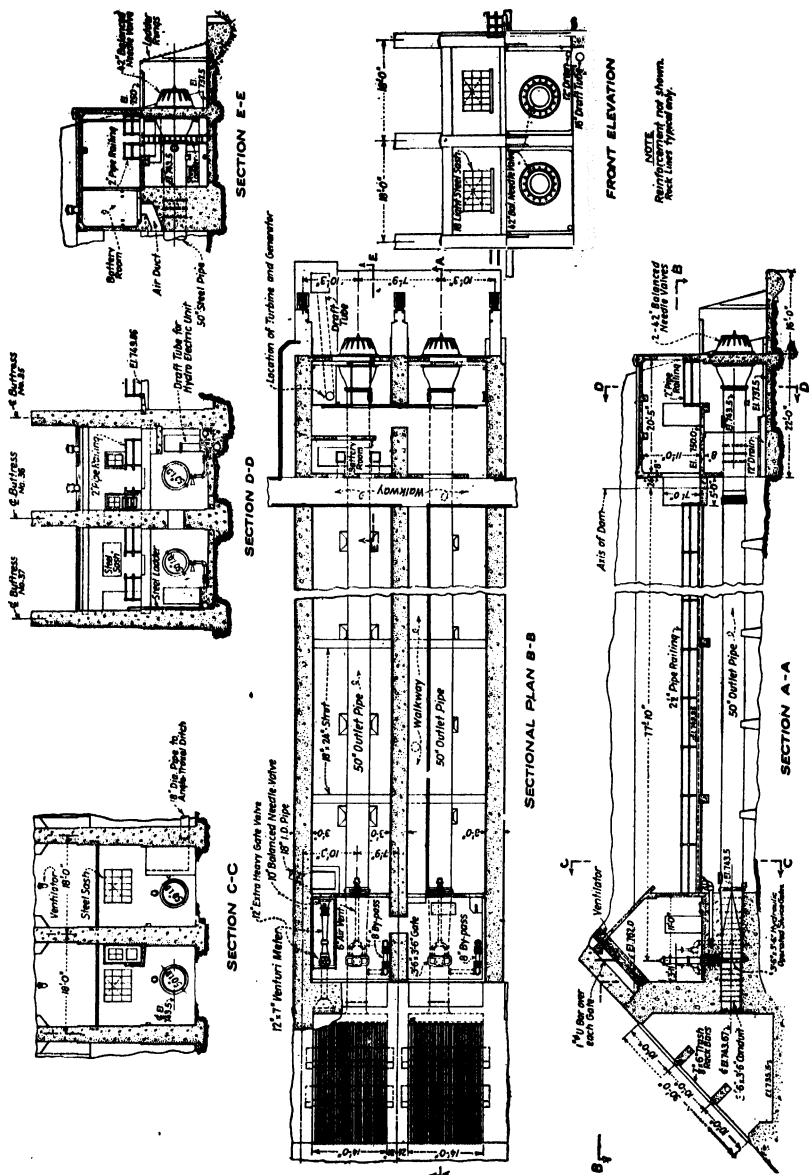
General arrangement of complete outlet works at Stony Gorge Dam. Typical outlet in Ambursen dam.
